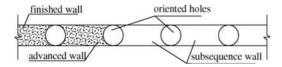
The two-drill-one grab method for the construction of the diaphragm wall.
